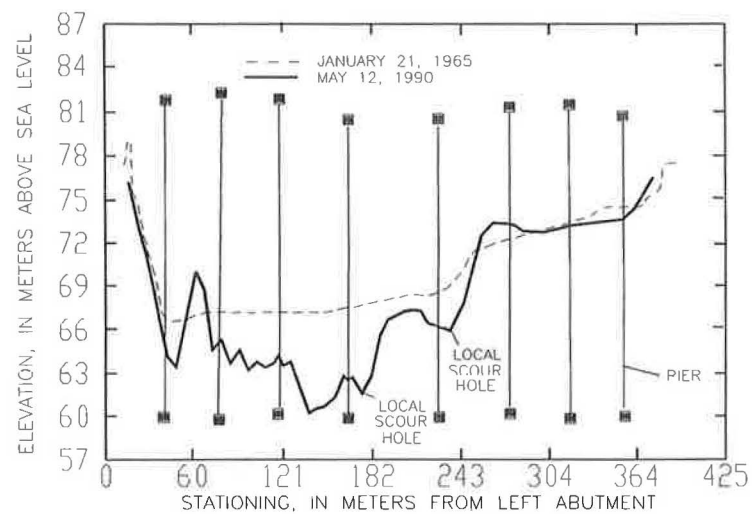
Channel cross sections based on data from bridge plans (January 21, 1965) and channel cross section measurements during flood of Red River at I-30 at Fulton, Arkansas (Site 10) along upstream side of bridge (May 12, 1990).
